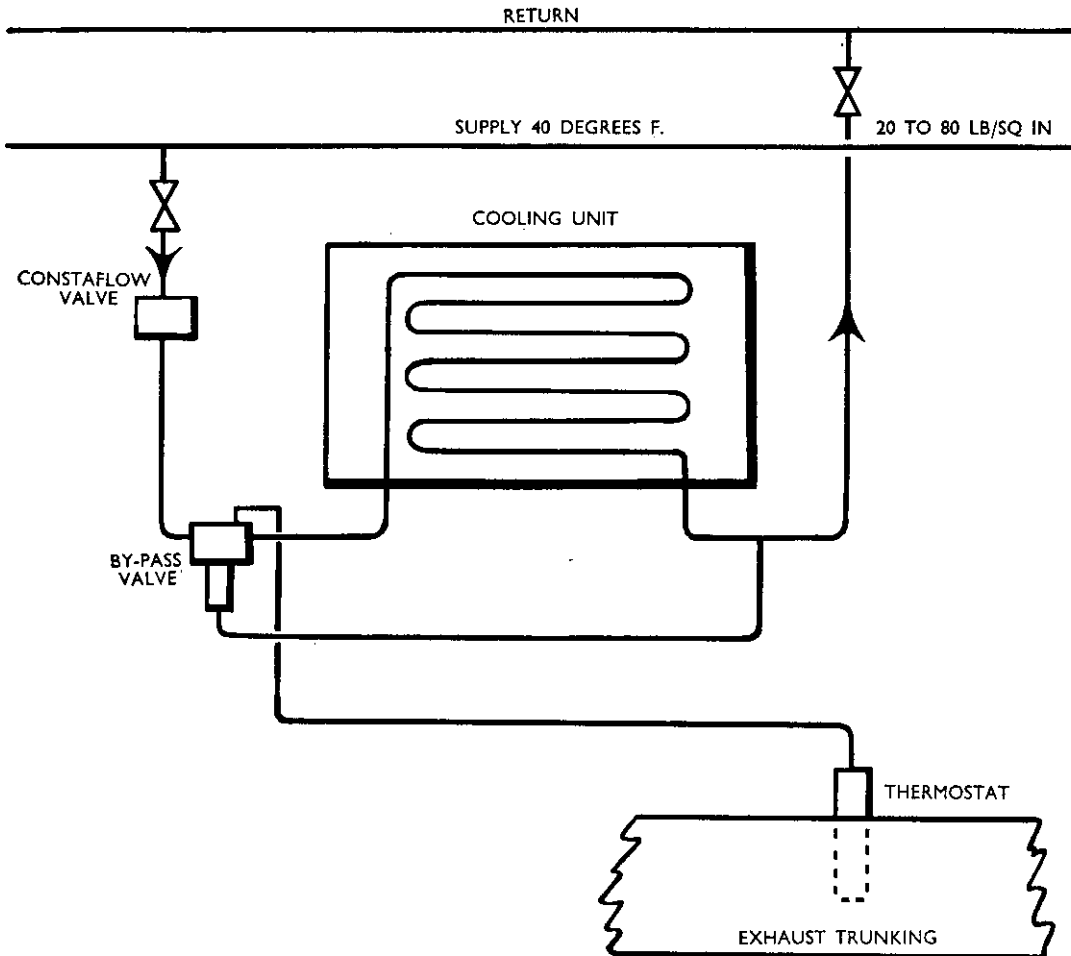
TYPICAL LAYOUT OF COOLING UNIT
